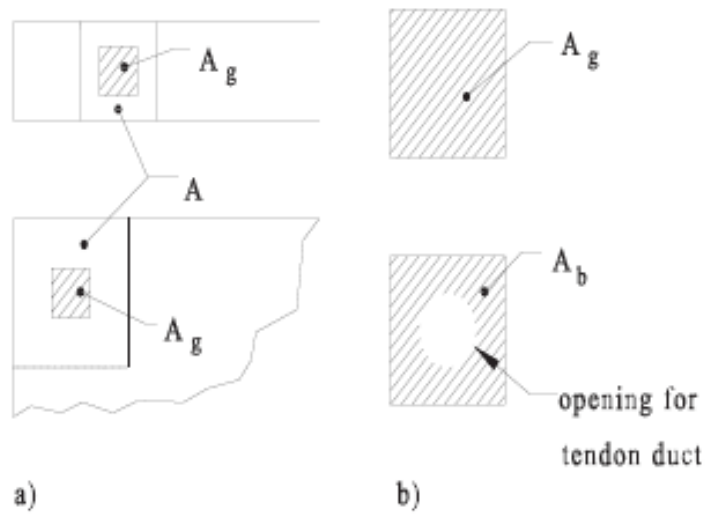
Area of Supporting Concrete Surface in Eq. 5.8.4.4.2-2
